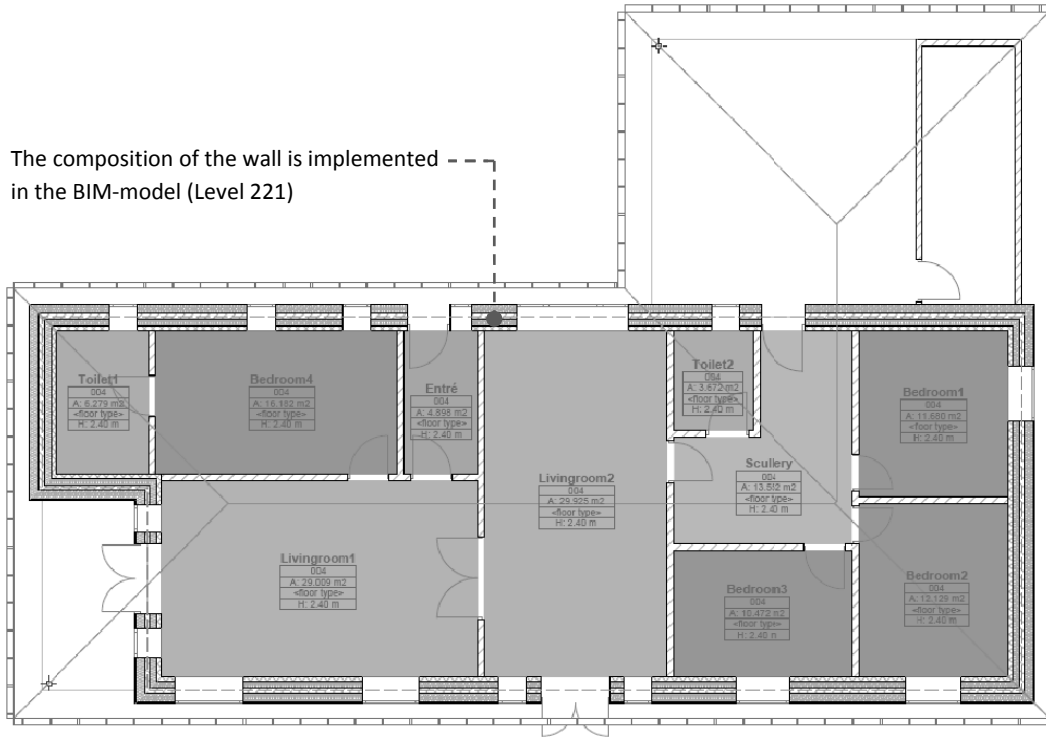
Floor plan from the BIM-model (Level 2.2), (not in scale)
